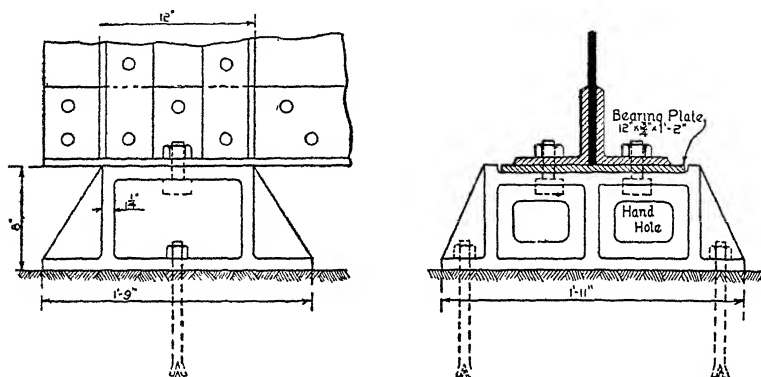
Side and End Elevations Showing Construction of Pedestal and Connection to Bearing Plate
